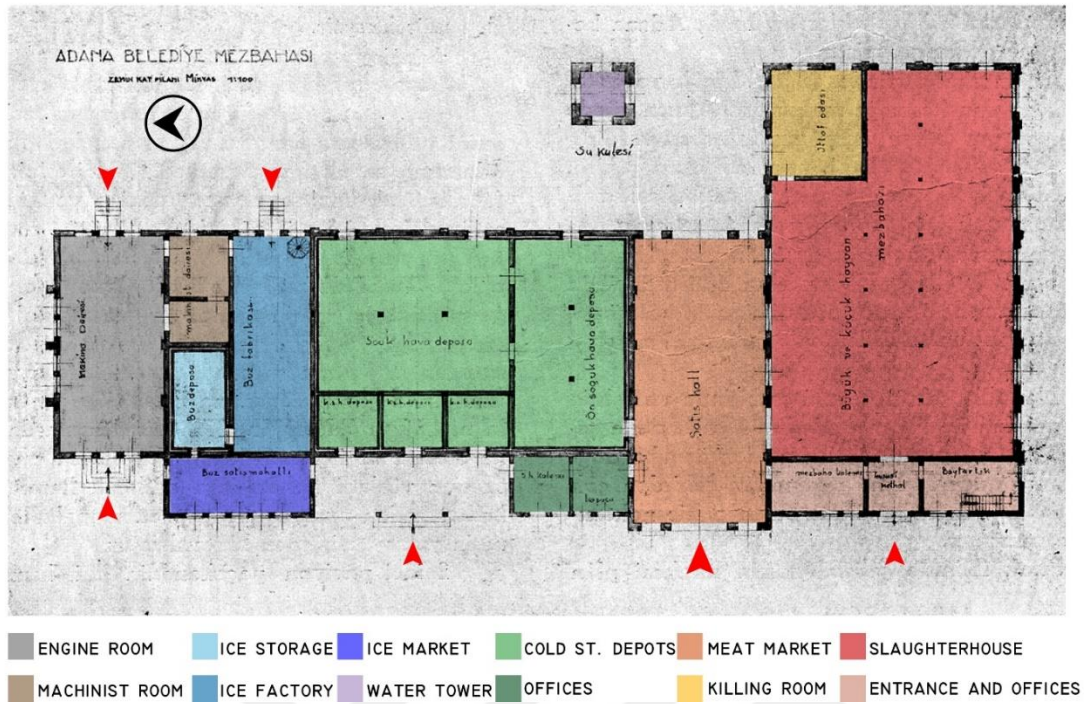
Ground floor plan of the slaughterhouse building (Source: Temel, 1933, p. 36) colored by the author.
